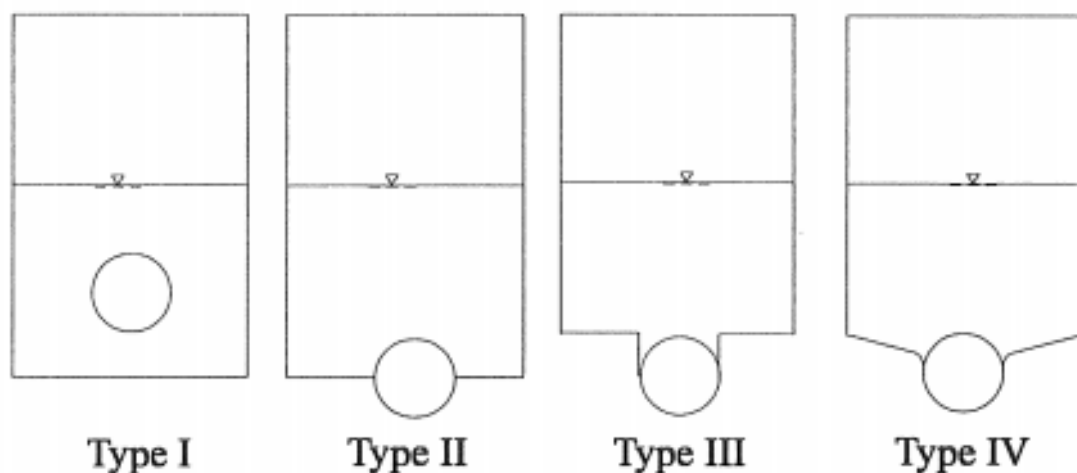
Elevations of typical manholes (surcharged condition) - Asztely (1995).
